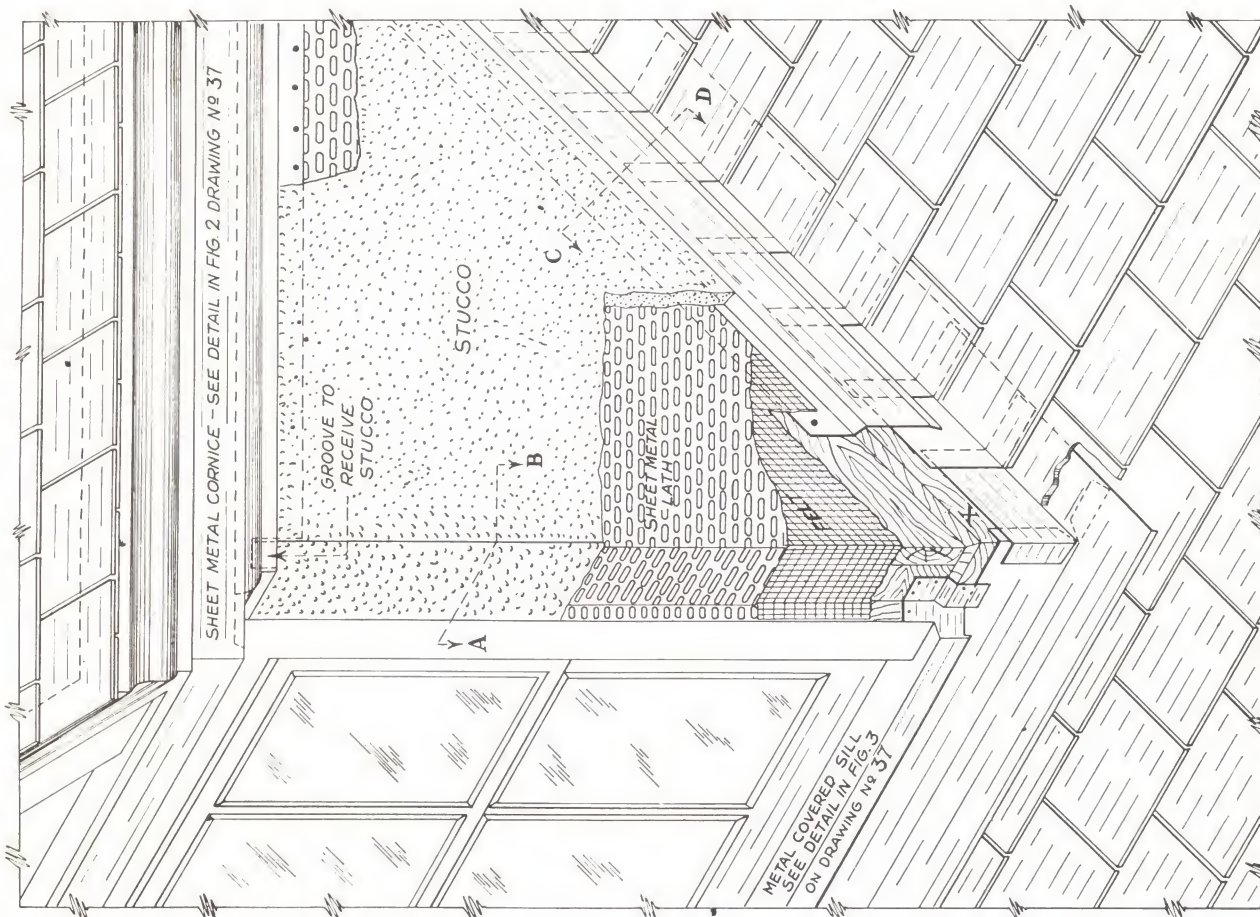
FLASHING DORMER WINDOW WHEN CHEEKS ARE COVERED WITH STUCCO
